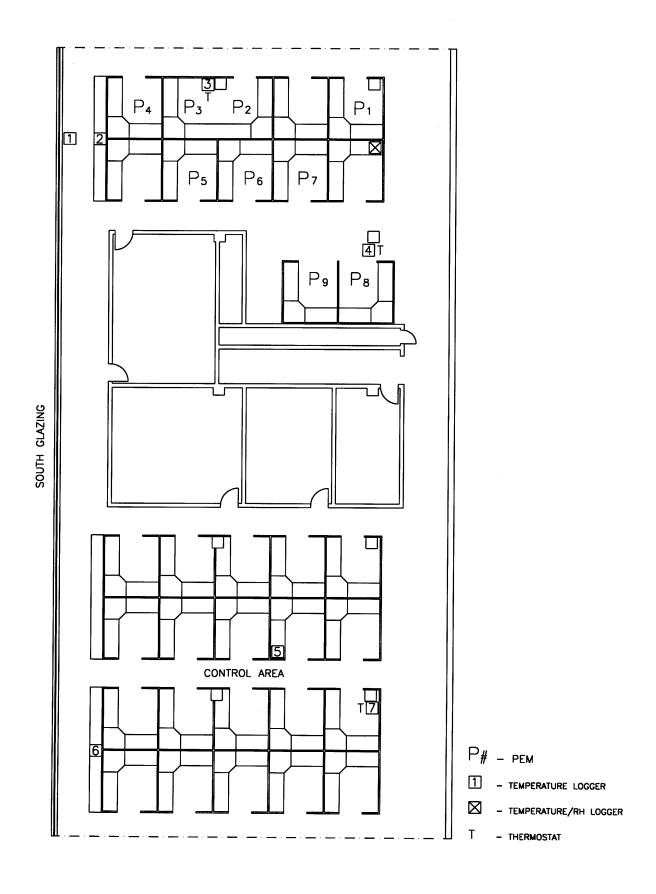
Floor Plan, PEM and Control Groups, 2nd Floor of 560 Davis St.
